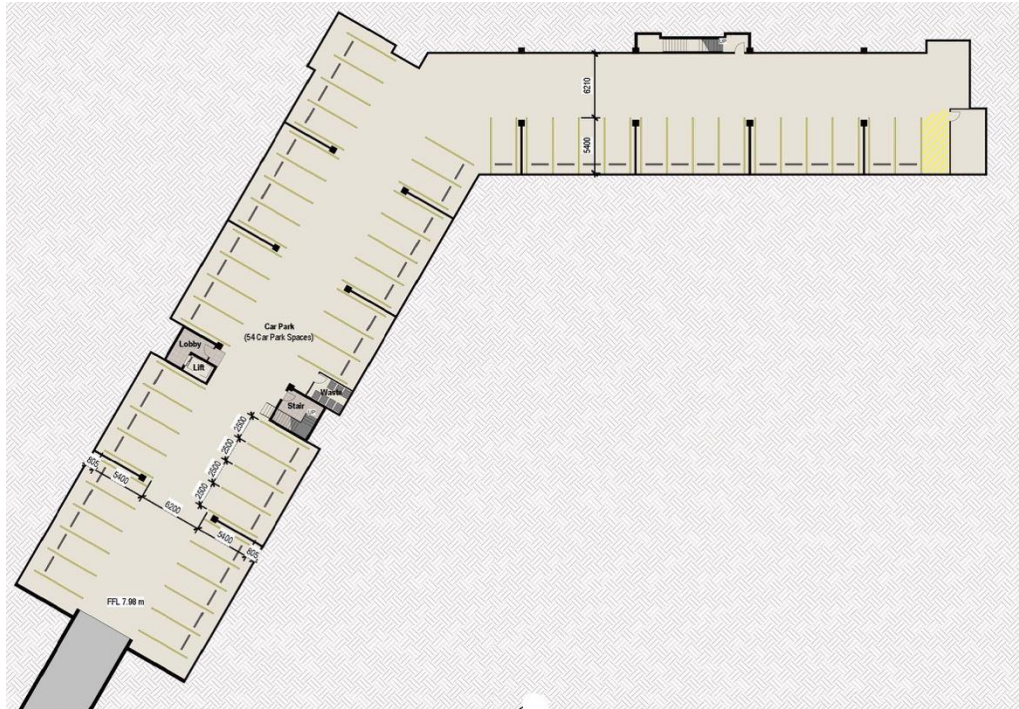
The Level 0 (basement) floor plan of Building B05 (Ryman Drawing A1-010 RC24).
